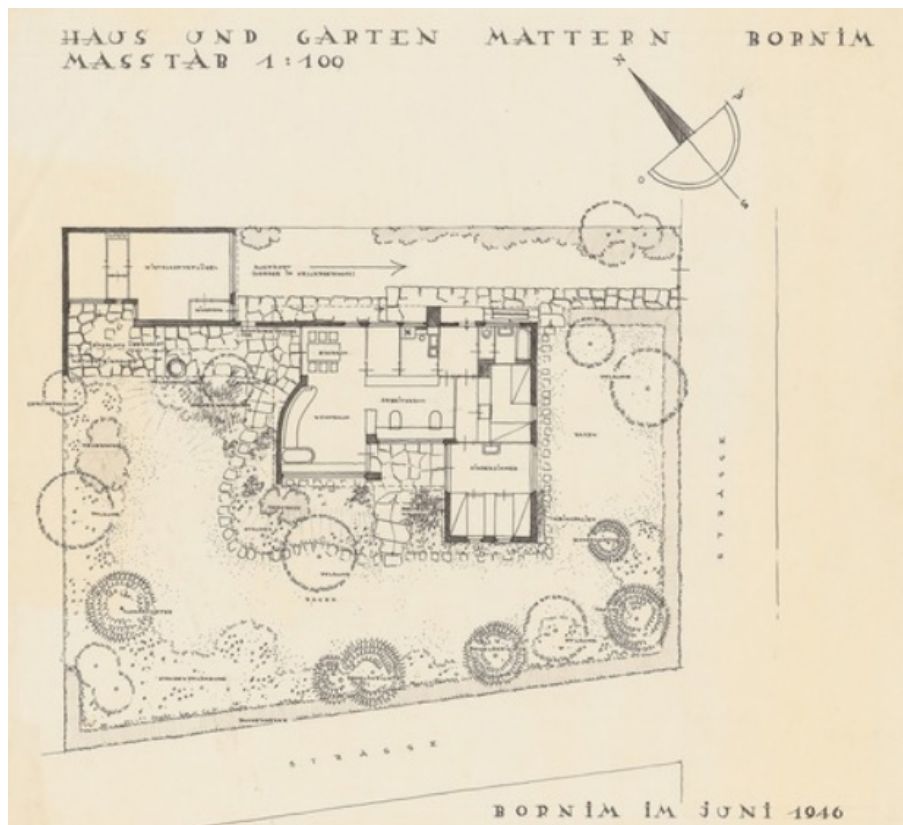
The plan of the Mattern house. On the street side it has smaller windows and pitched roofs while at the garden side the facade has large windows and terraces. A natural looking paved path connects the garden to the living room, as well as to the street side. A small pond and mini plants are placed next to the living room, providing an intimate atmosphere (Architekturmuseum, 1946)
